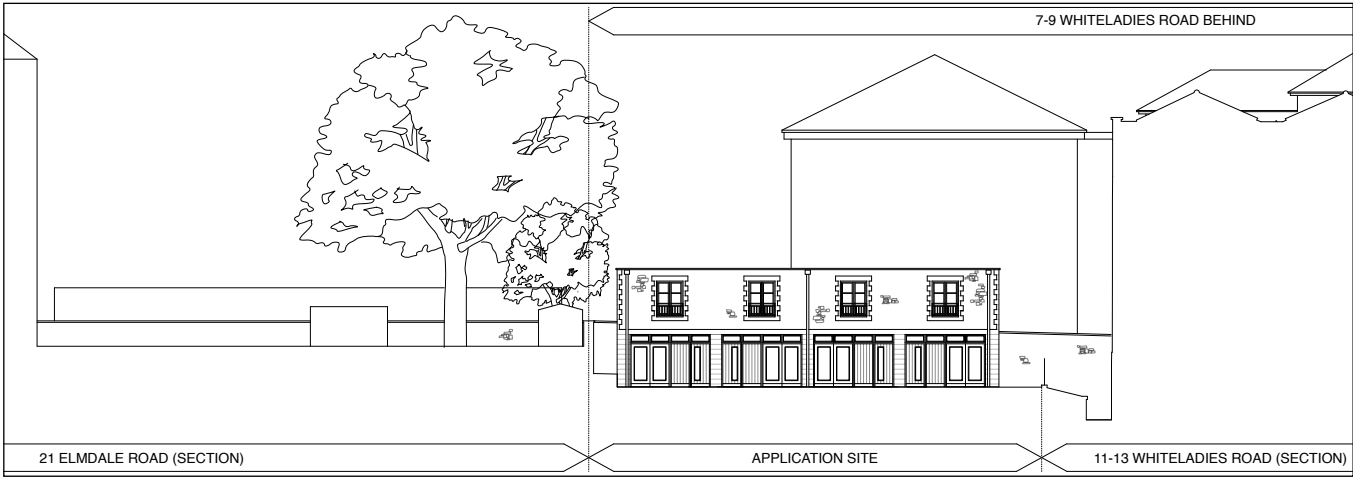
Proposed north & front elevation in comparison to the surrounding existing buildings
